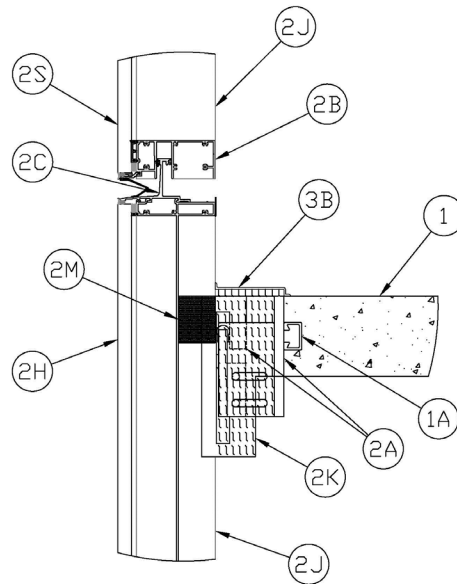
Base Detail Between Face-Mounted Anchor (Mullion Plug)
